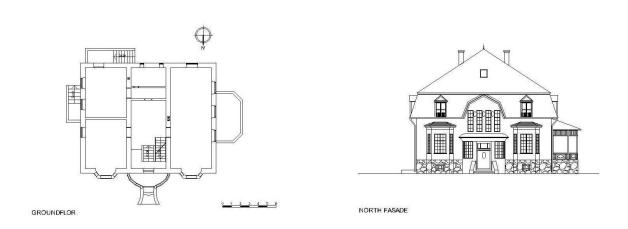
Ground floor plan and the street façade of the house (Sketch by Tijana Glamočić)
